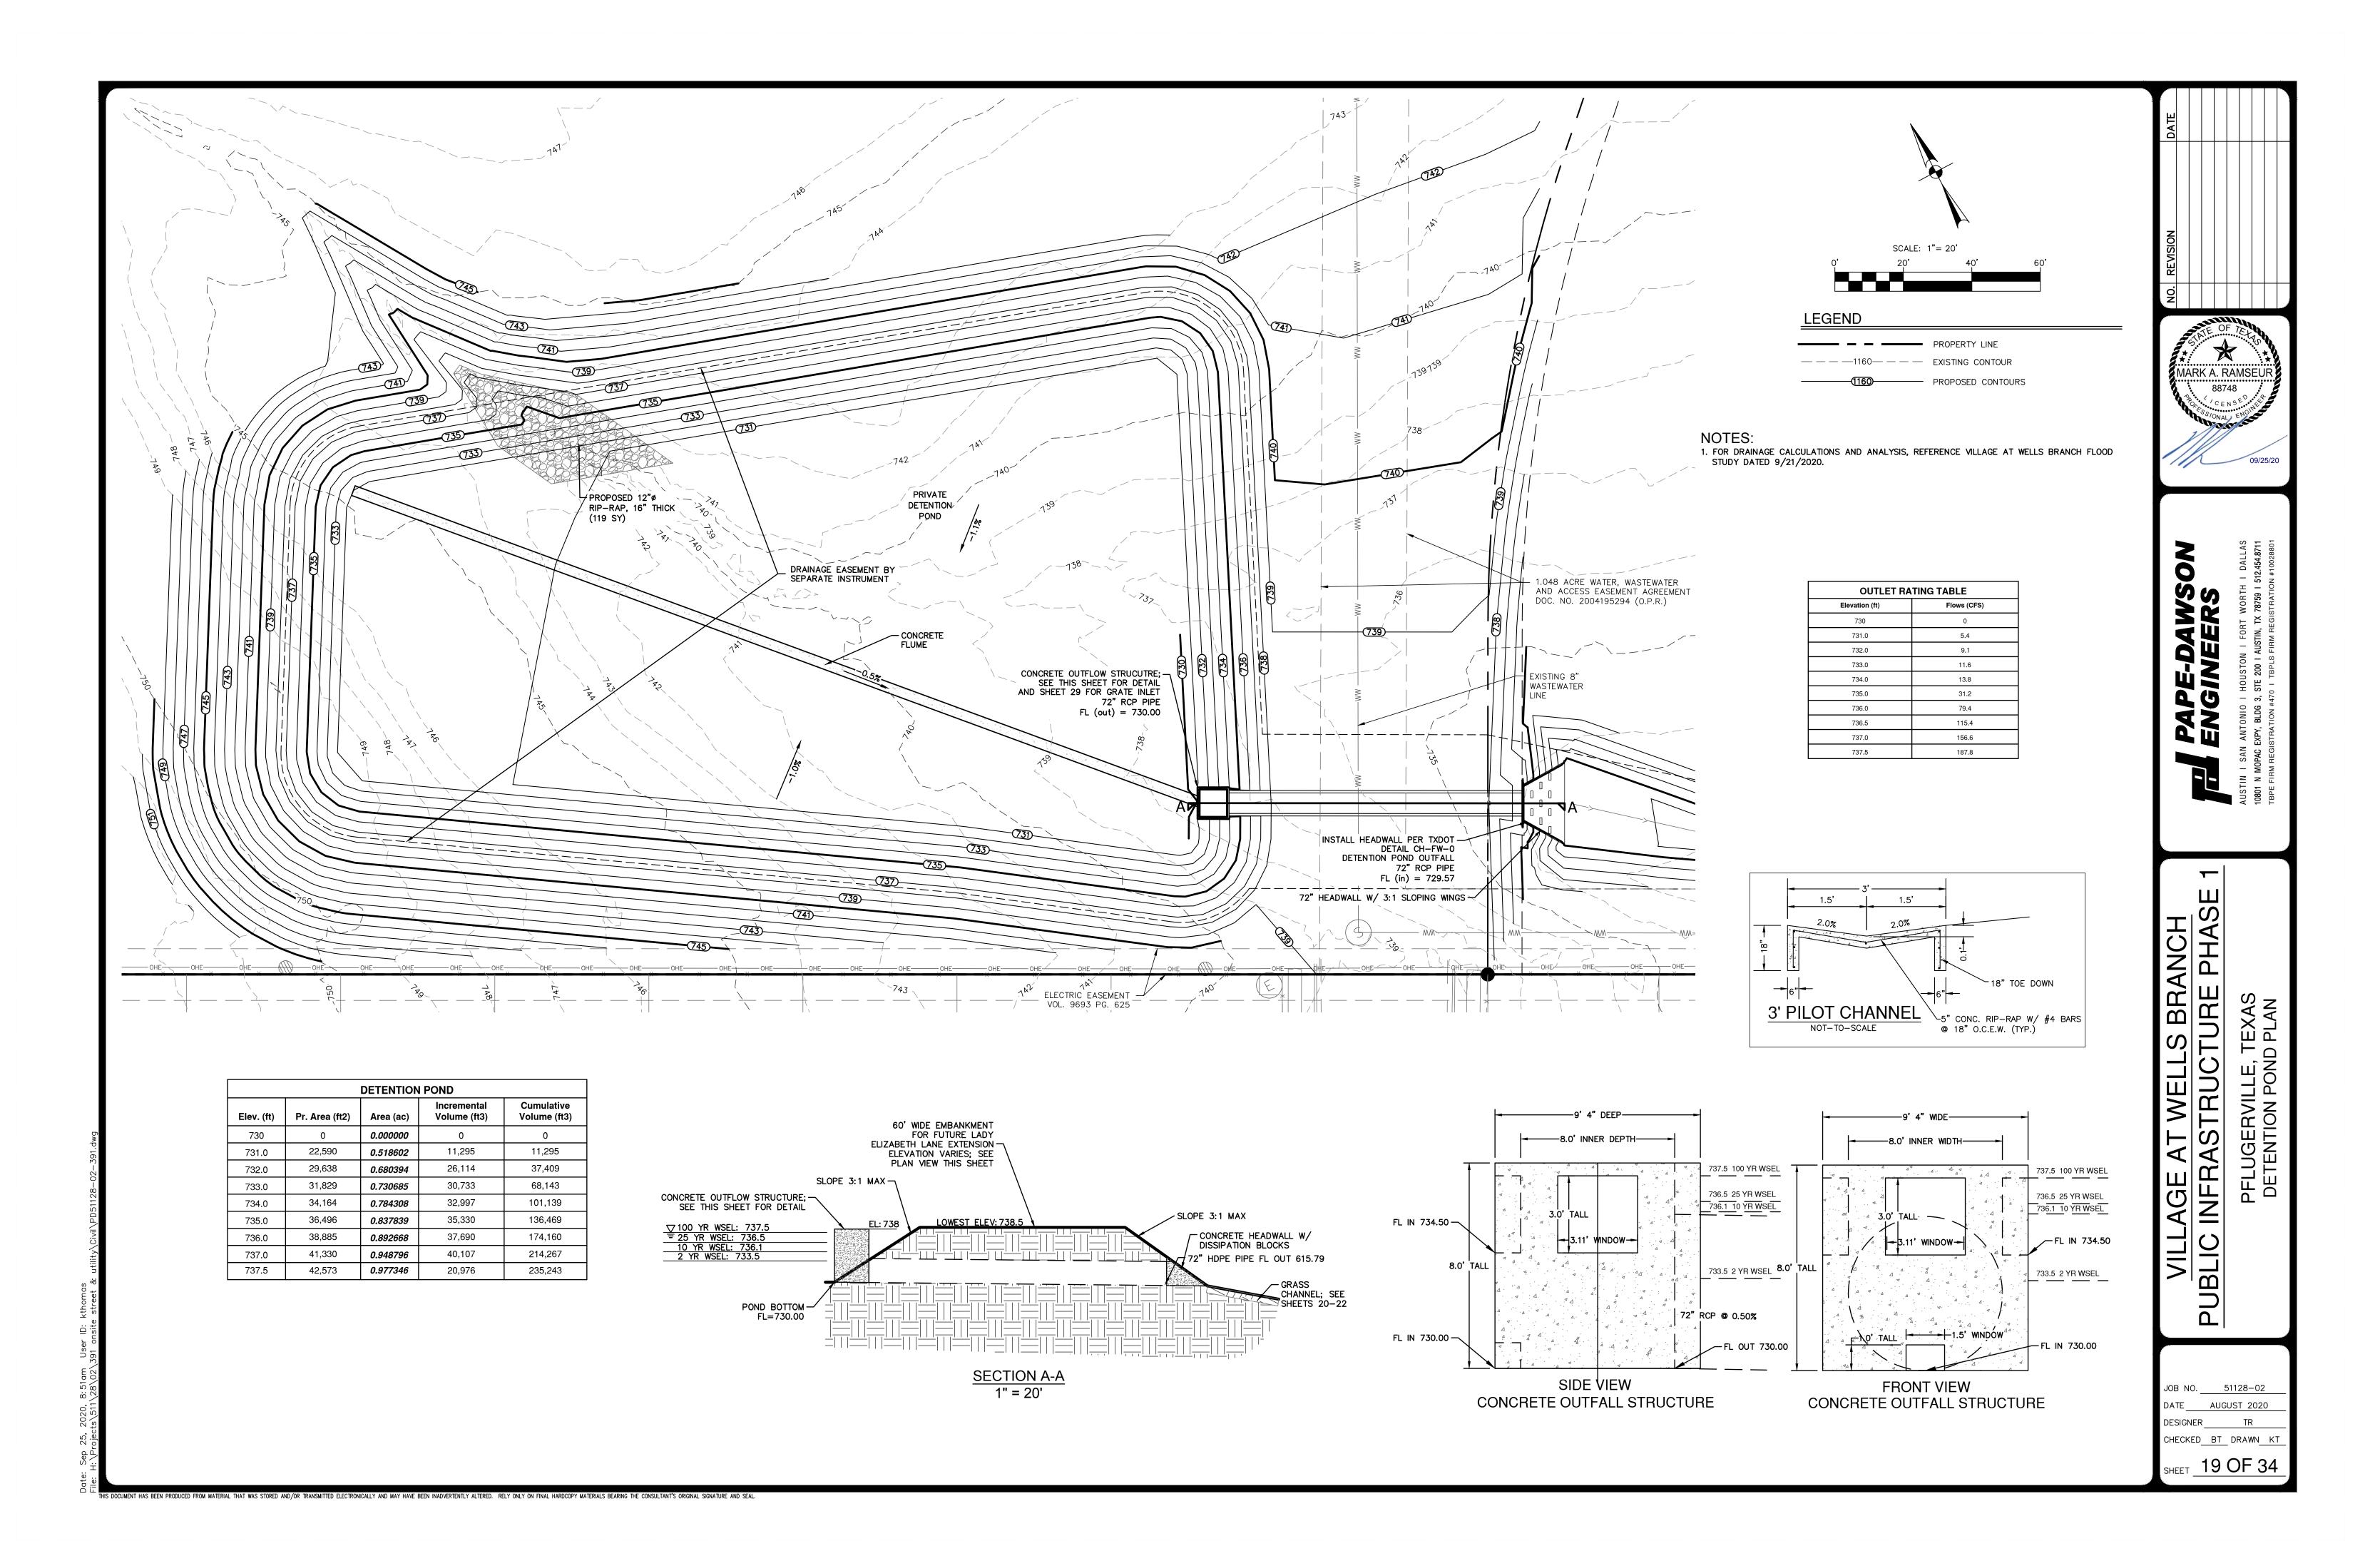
EXHIBIT B PERMANENT STORMWATER MAINTENANCE PLAN
